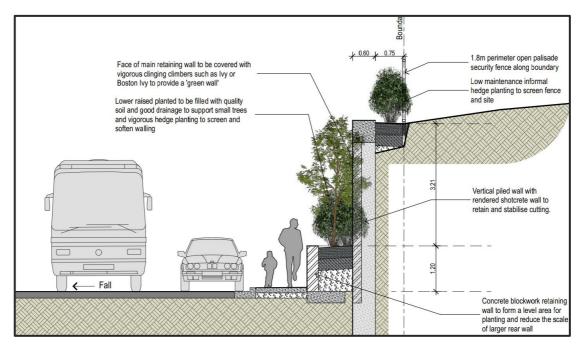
| Section through the driveway showing the retaining wall (Source: Applicant's EIS 2018)
